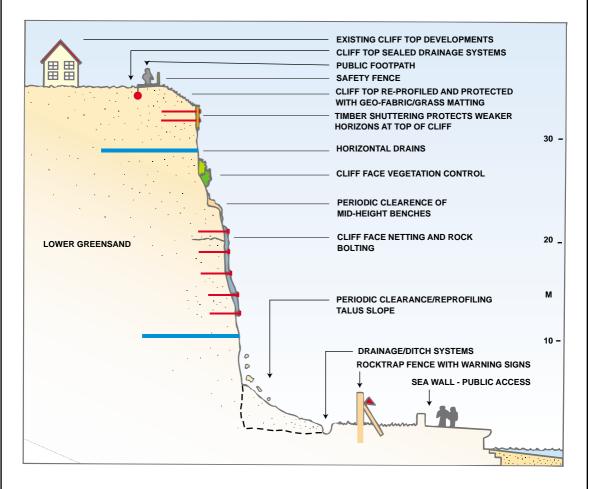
Cross section illustrating stabilization measures, Sandown Bay.
